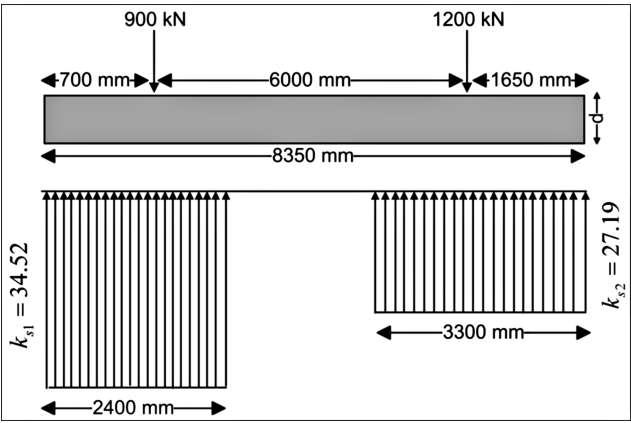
C.17 Details of loading and modulus of the subgrade reaction of the beam resting on the elastic foundation (Example 12.6).
